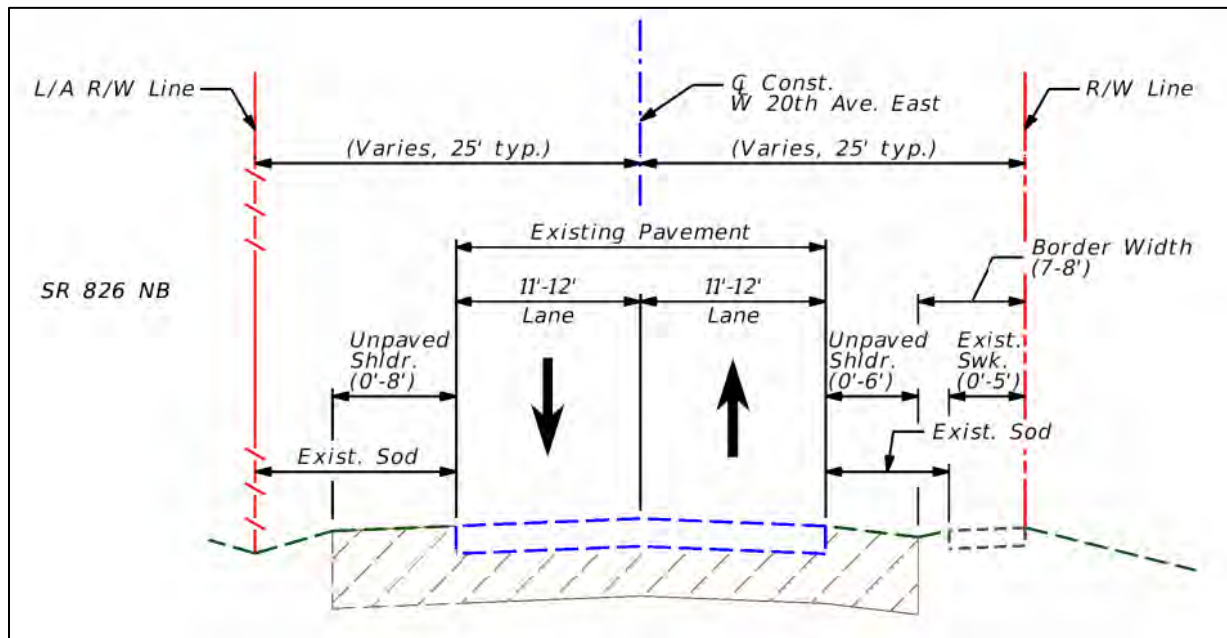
Existing Frontage Road (Undivided) – Typical Section 8 (East Frontage Road/W 20th Avenue East)
